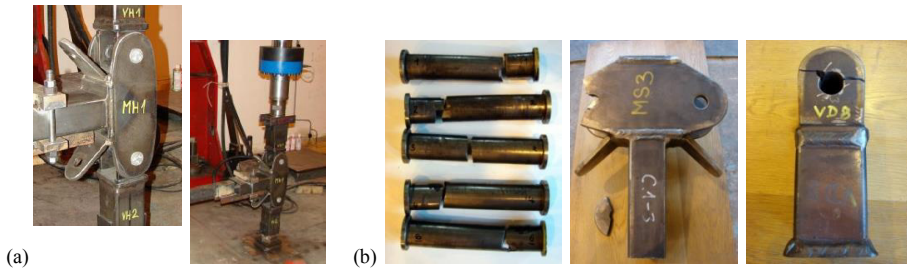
Connections of long footbridge: (a) test specimen and test arrangement – specimen installed in testing equipment, testing process; (b) typical failure modes – pin failure, failures of middle part (MS) and end part (VD) around holes for pins.
